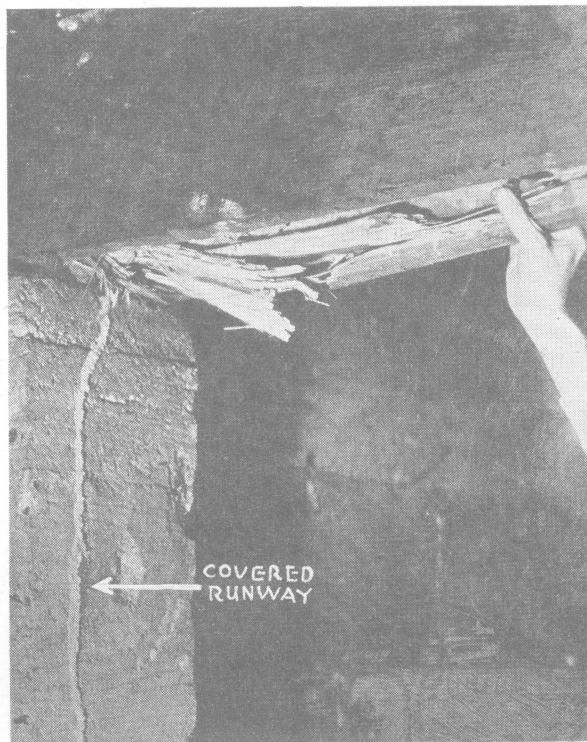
Note the covered runway or "tube" built by termites to connect the wood beam, their feeding ground, with the soil and moisture below.
